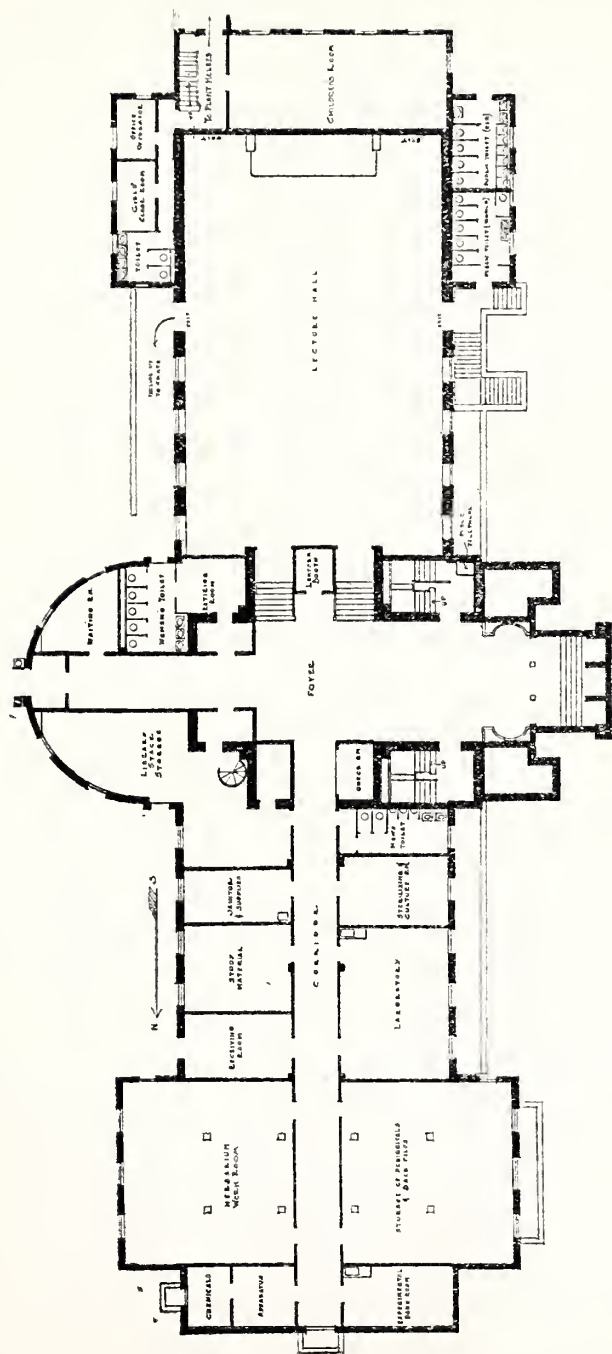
Laboratory Building. Basement floor plan. South exits of lecture hall open into sub-basement, under the children's room.
